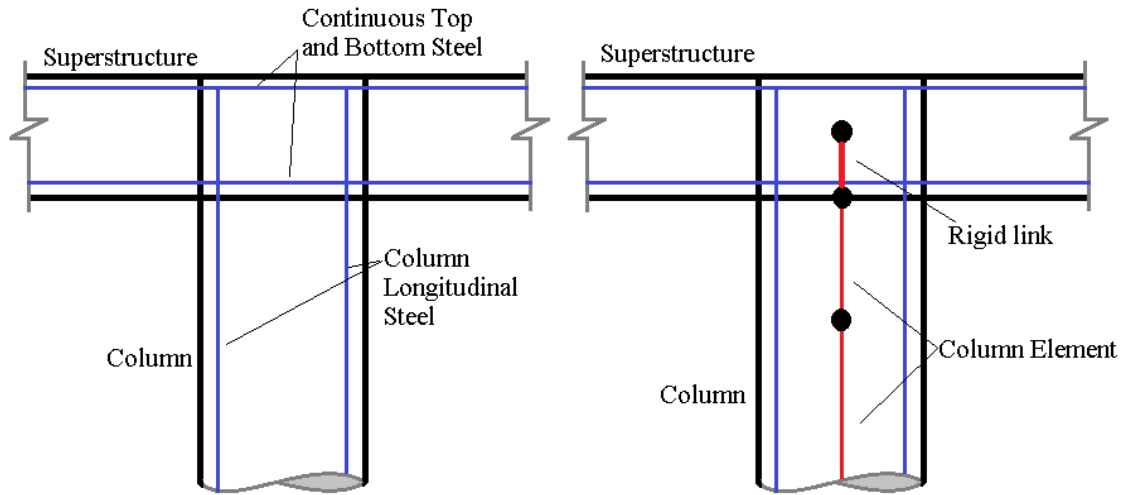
Joint connection between the column and superstructure of the MSC box girder bridge.
